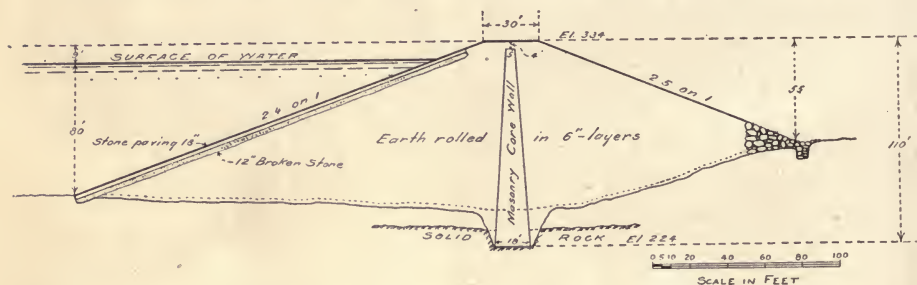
CROSS-SECTION OF A TYPICAL NEW ENGLAND DAM.
